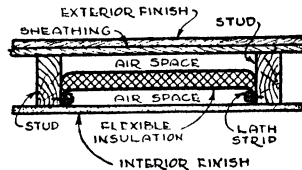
Application of Flexible Insulation to Frame Construction by Means of Lath Strips Nailed through Insulation into Sides of Framing Members
